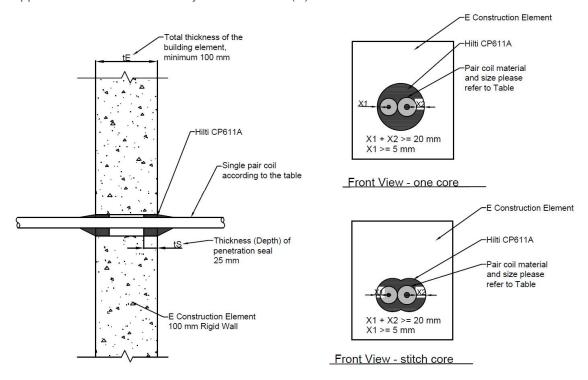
Single pair coil penetrating minimum 100 mm thick rigid wall
